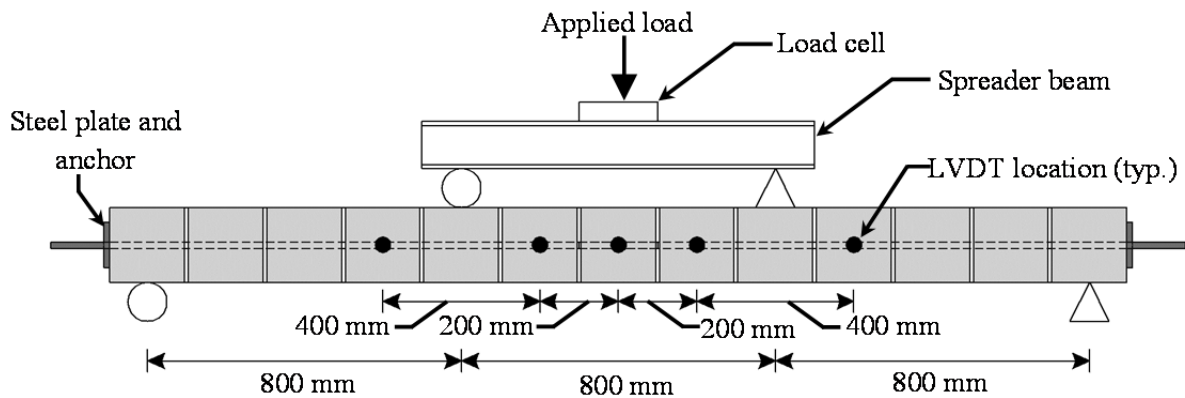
Loading Geometry and Instrumentation on Wall Splice Specimen
